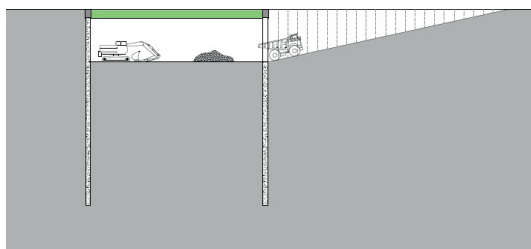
Schematic of the Third Phase - Pouring of the Roof Slab and Construction of the Access Ramp
